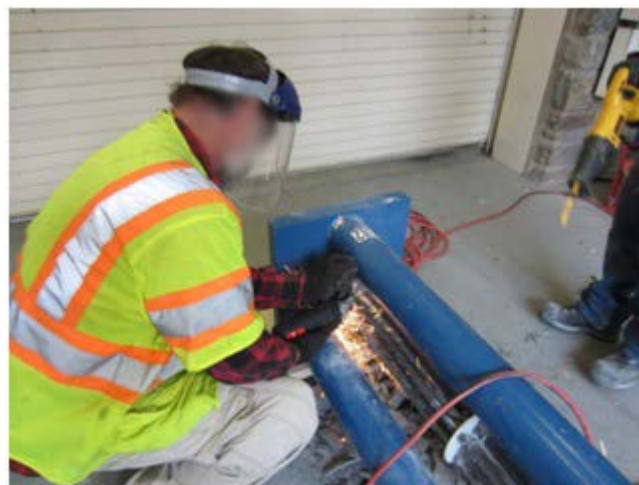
Photo. Cutting PT strands near the lower anchor bearing plate.
